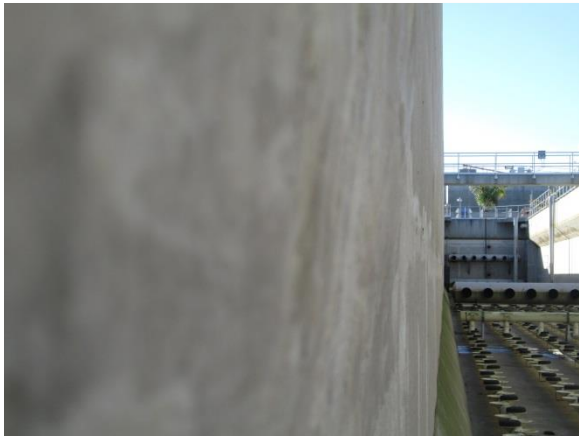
Uneven construction joint (approx. 1-inch offset) on east wall about 150 feet south of north wall.
